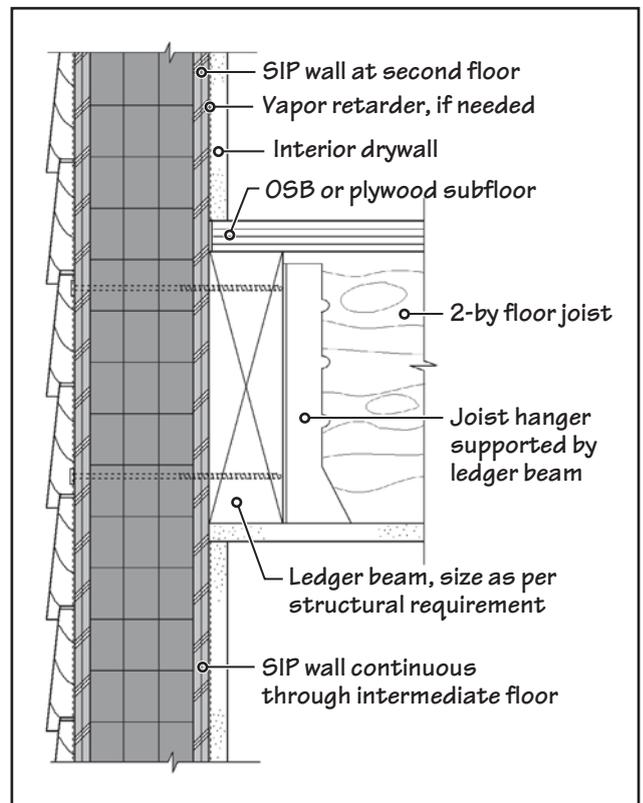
Detail at the intersection of a floor and a SIP wall where the SIP wall is continuous through the floor.
